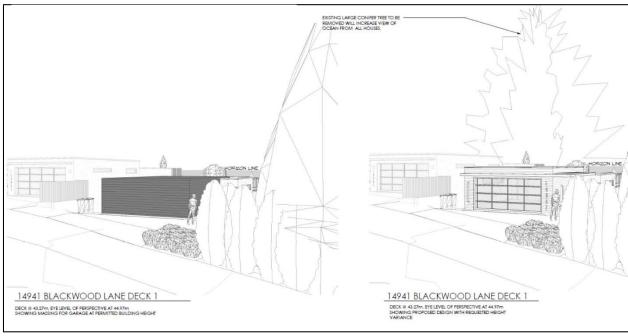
Maximum Building Height Versus Proposed Building Height Along Blackwood Lane (looking south)
